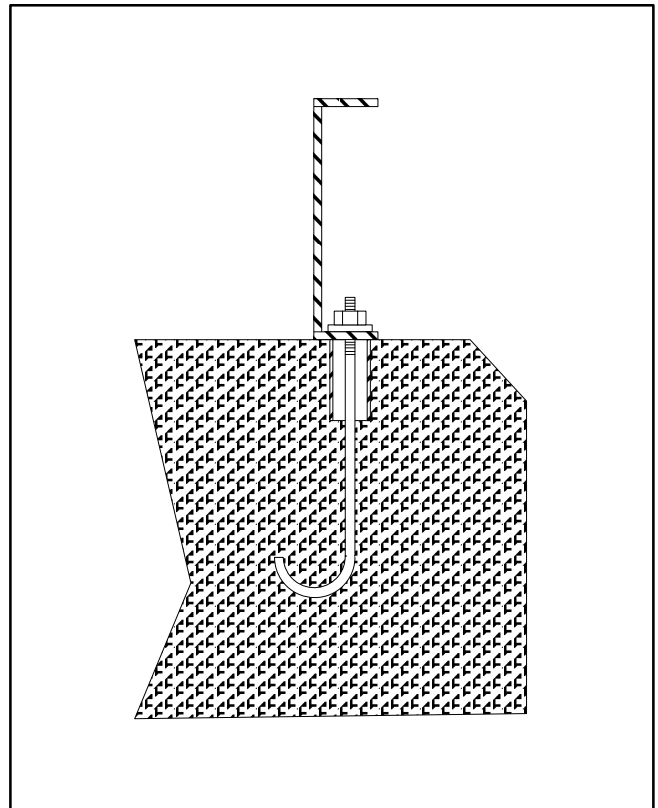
TYPICAL CONCRETE ANCHOR BOLT
